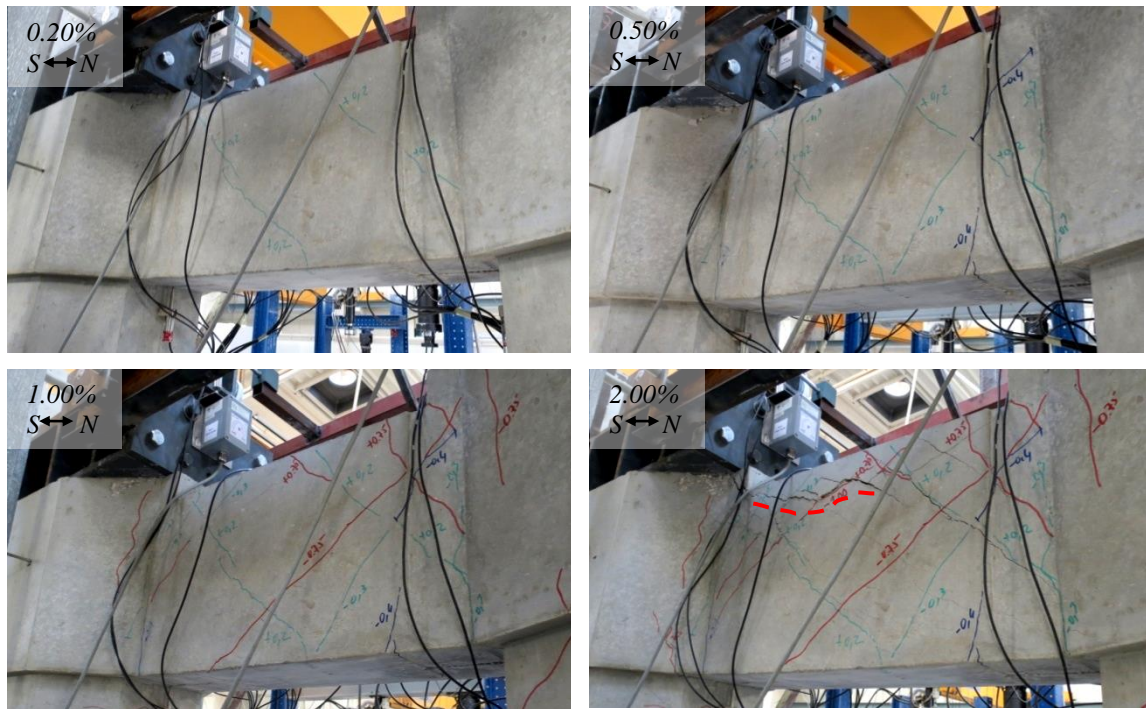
SP_M03 Beam cracking pattern
